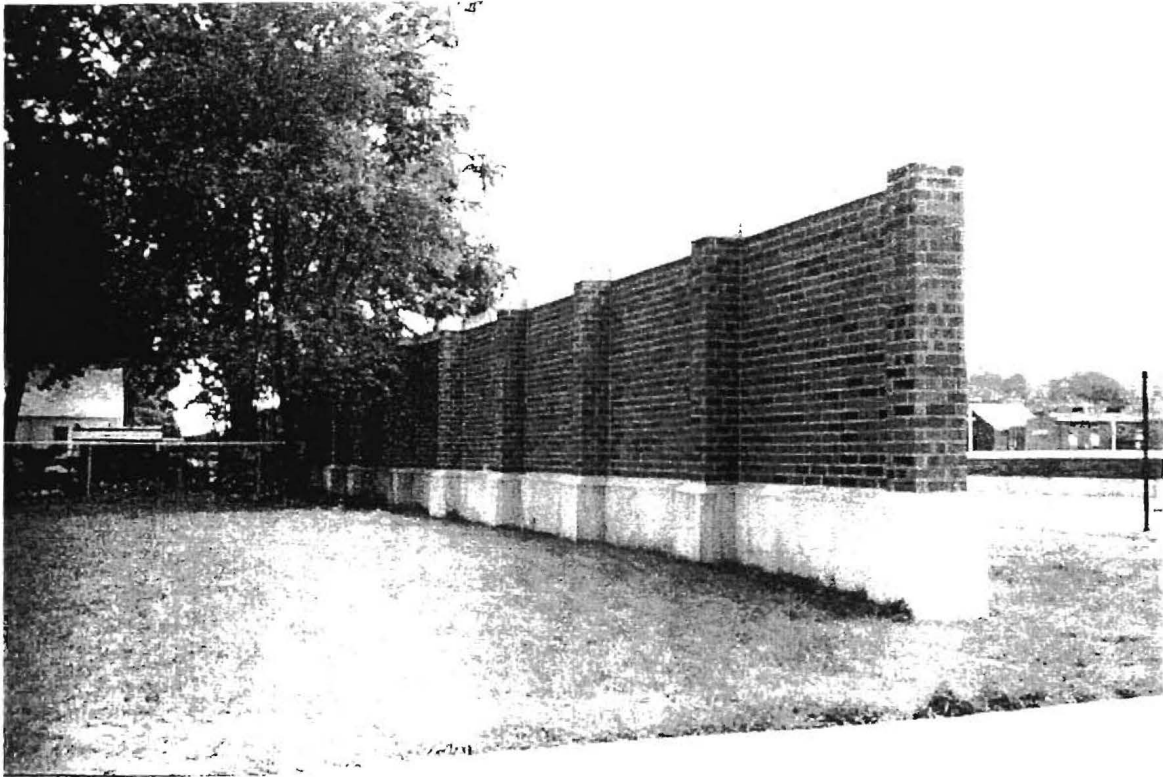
Brick Wall on Concrete Base Wall Complimenting Surrounding Brick Architecture (Michigan DOT)
